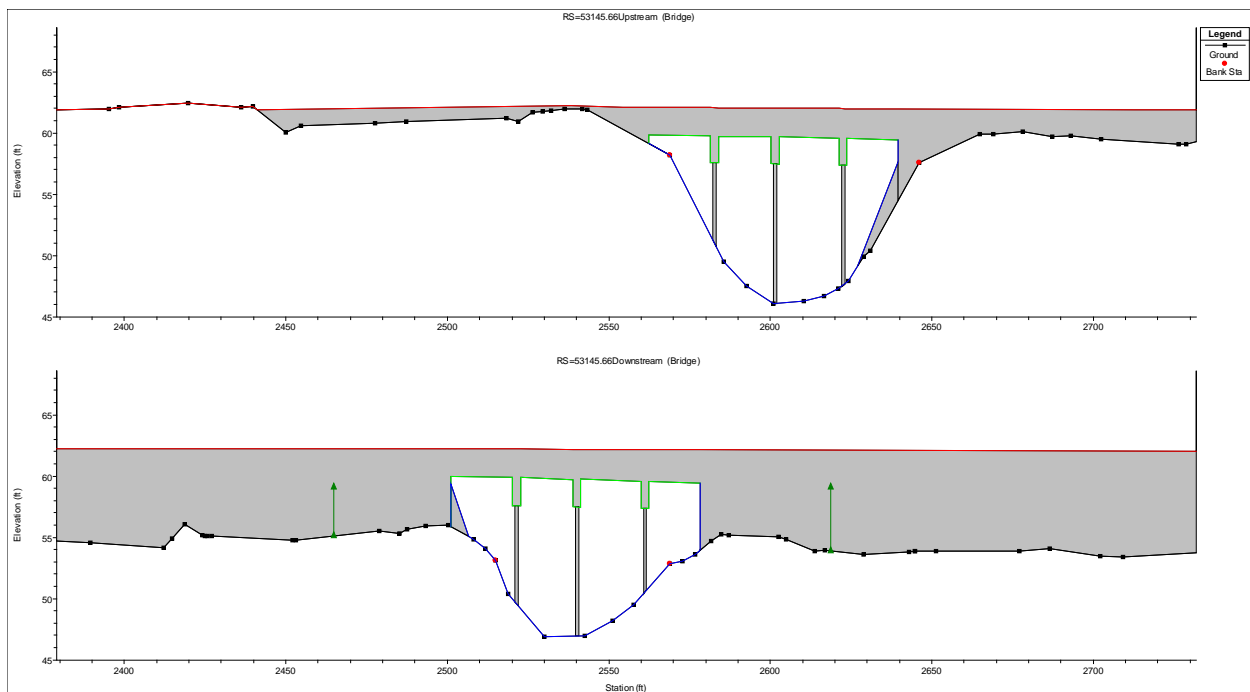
Bridge Street Bridge Corrected Effective HEC-RAS Transect, in which roadway elevation, pier width, and rip rap location were corrected
